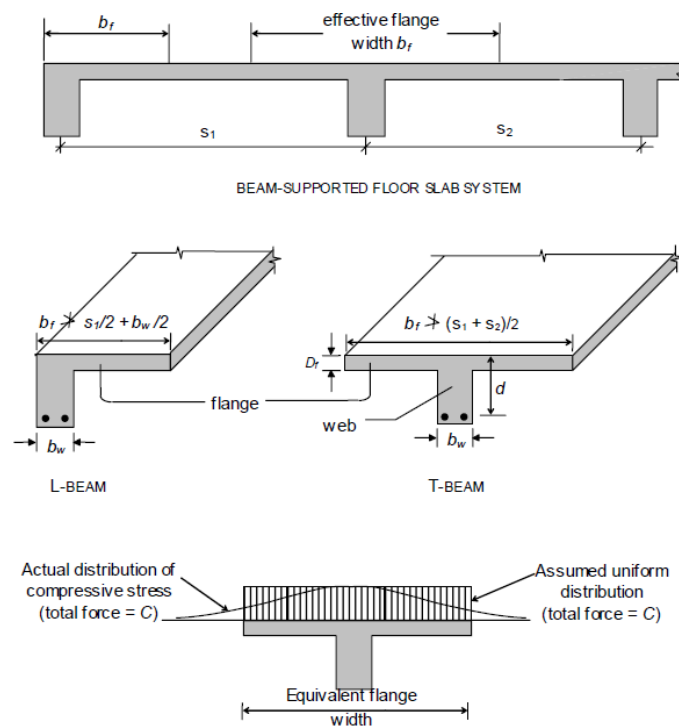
T-beams and L-beams in beam-supported floor slab systems
